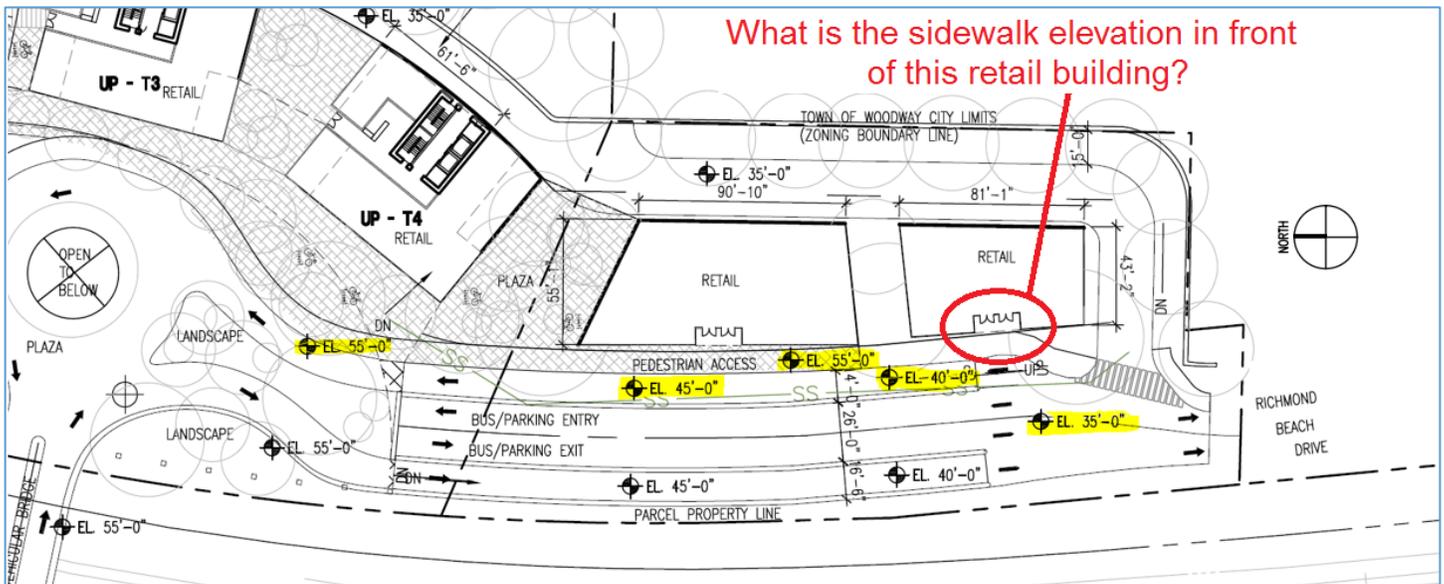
Pedestrian Access Problem to Southern Retail Building
